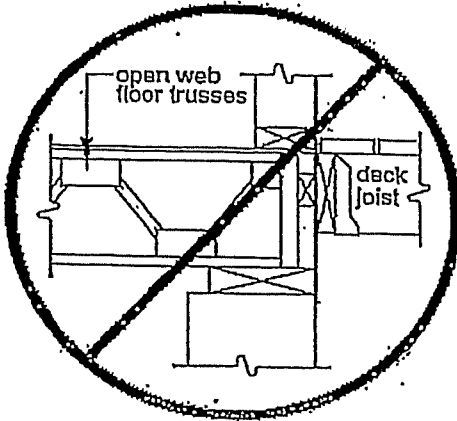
NO ATTACHMENT TO OPEN WEB TRUSSES
